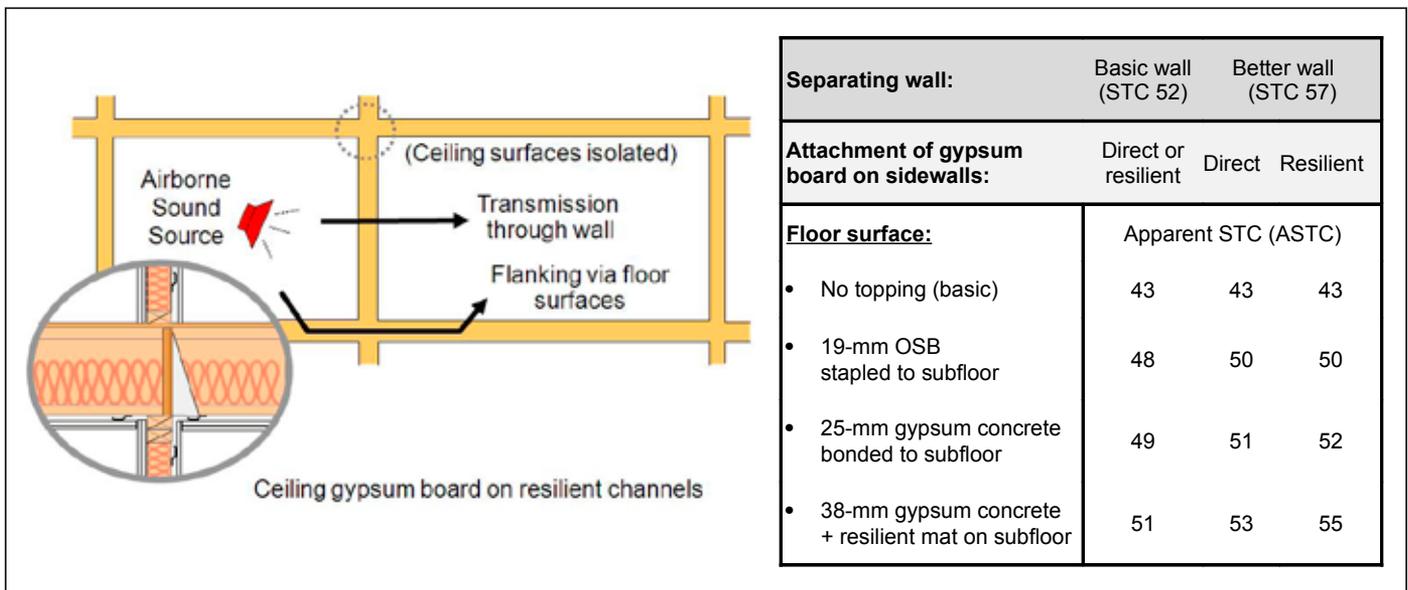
and Table 1: Typical sound transmission paths between adjacent one-level apartment units. The sidewalls abutting the separating wall also transmit sound, but resilient channels supporting the gypsum board ceiling block structure-borne transmission via the ceiling surfaces. The table presents the apparent STC for the specific separating wall and floor constructions illustrated in Figure 11, with various treatments of the floor and wall surfaces.
